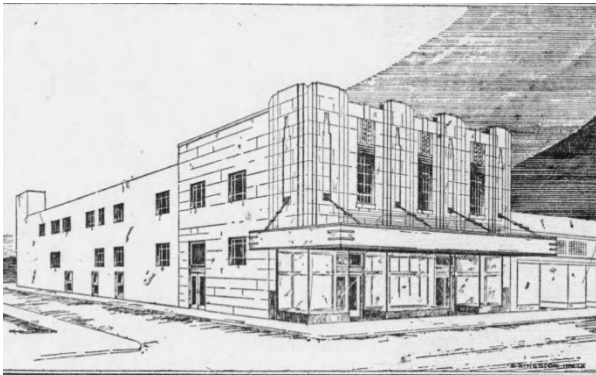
Rendering of Woolworth's store, 545 Washington Avenue, Miami Beach, 1937.
